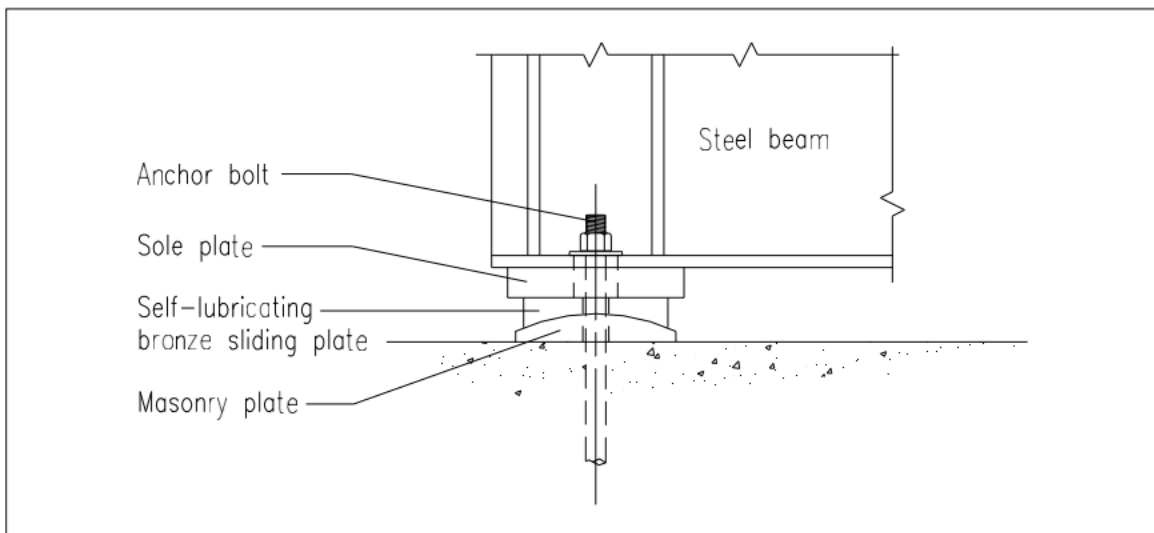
Typical Bronze Sliding Plate Bearing
